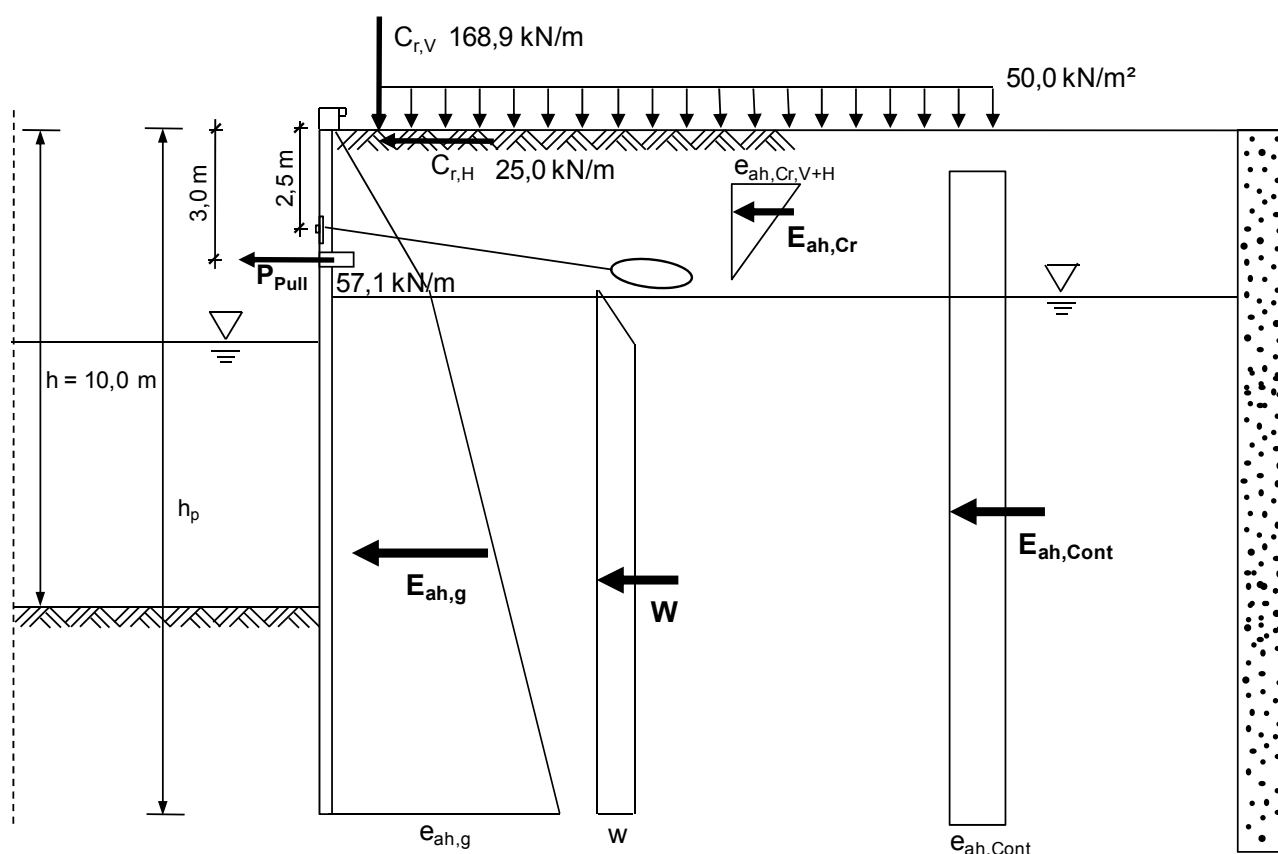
Loads and dimensions for the design of the sheet pile quay wall
